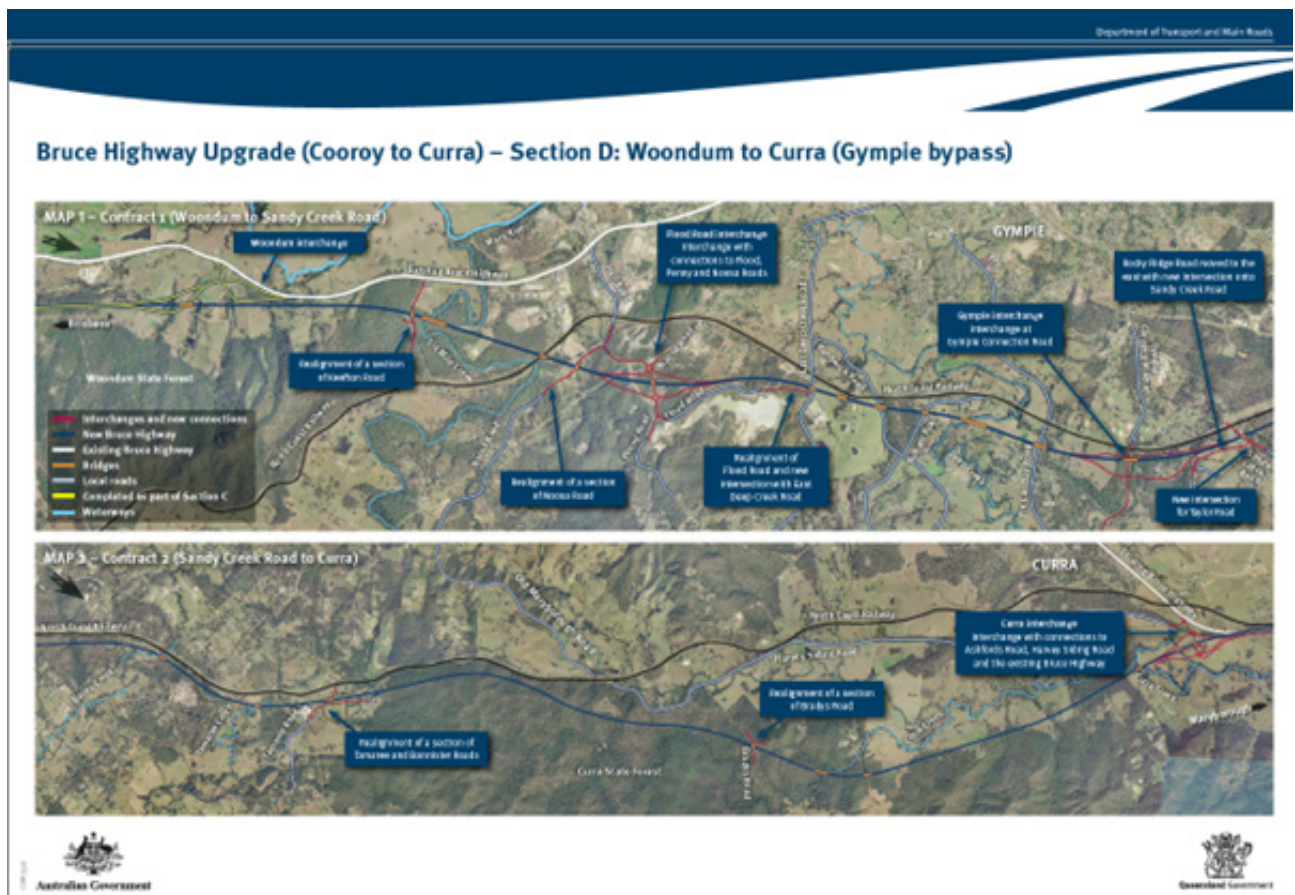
Section D of the new Bruce Highway Upgrade showing the new alignment to bypass Gympie
